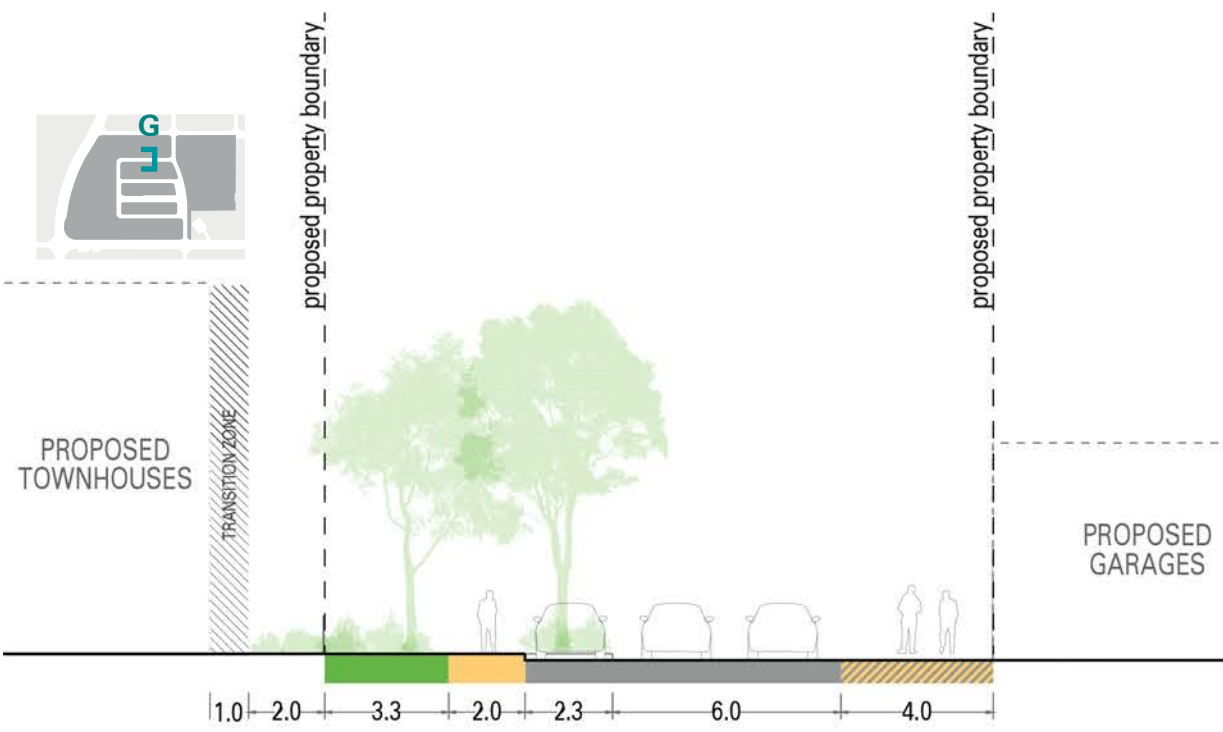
Section G: Precinct Street (East-West) (1:200@A3)
